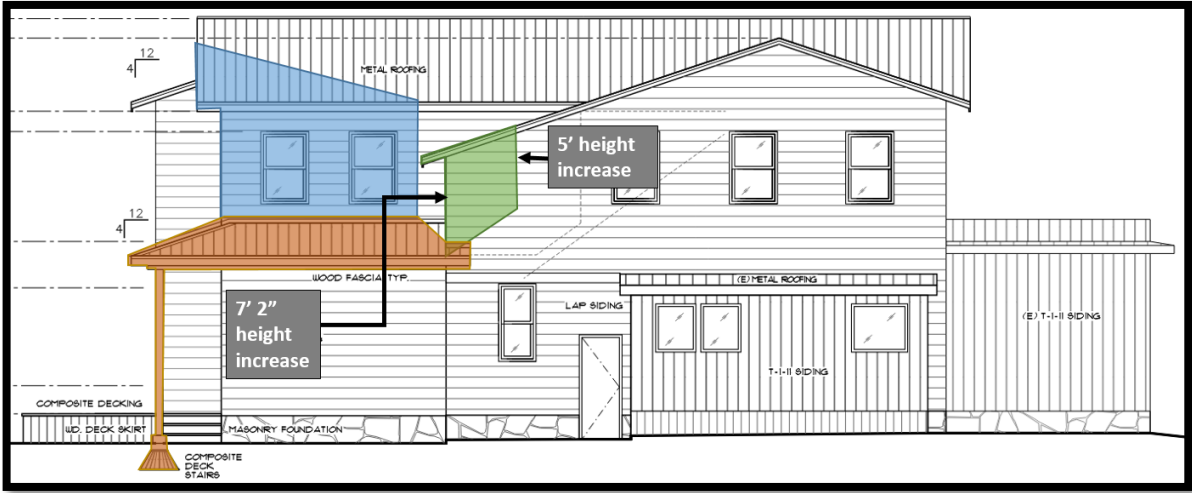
Figure A - View of Rear Elevation from Alley – Proposed Encroachments
